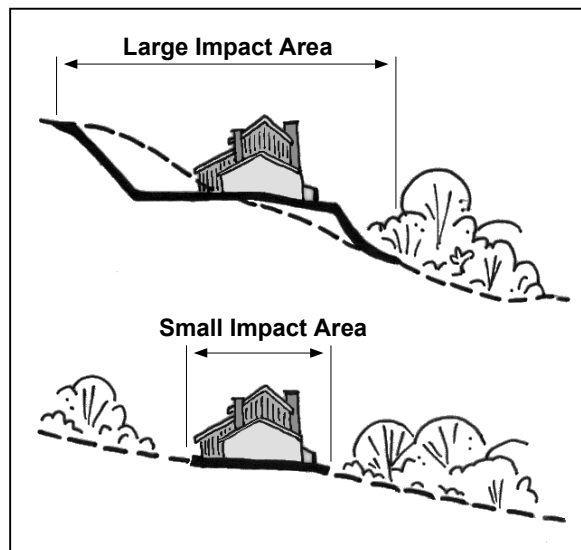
Flattening Steep Slopes for Building Sites Uses More Land Area than Building on Flatter Slopes
